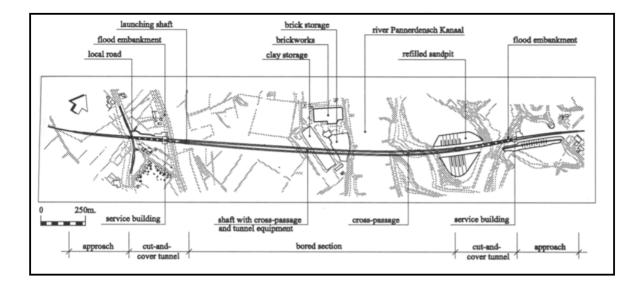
Betuweroute railway tunnel alignment(Tunnelling and Underground Space Technology)
